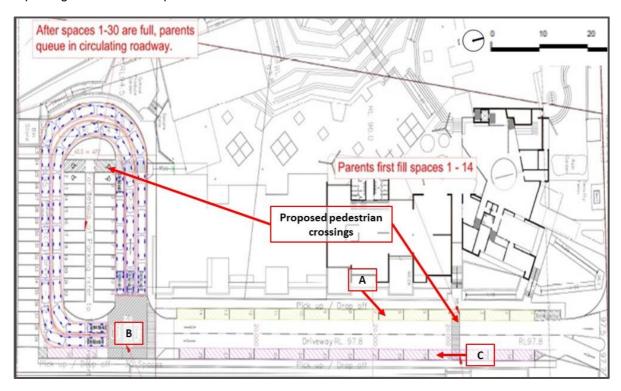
| Proposed management measures in the drop-off / pick-up area (A: Spaces 1 – 15. B: turning point for parent leaving spaces 16 – 28 C: spaces 16-20) (Source: Applicant's EIS 2018)
